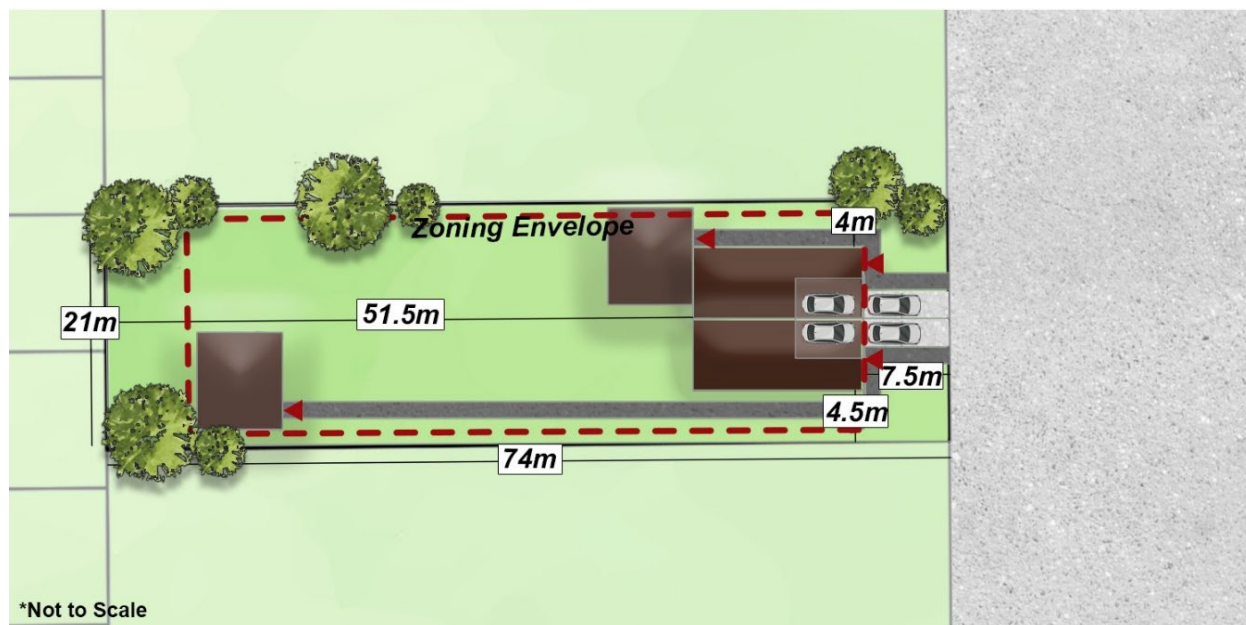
Duplex Interior Lot with Frontage on Highway 48 Concept Plan
